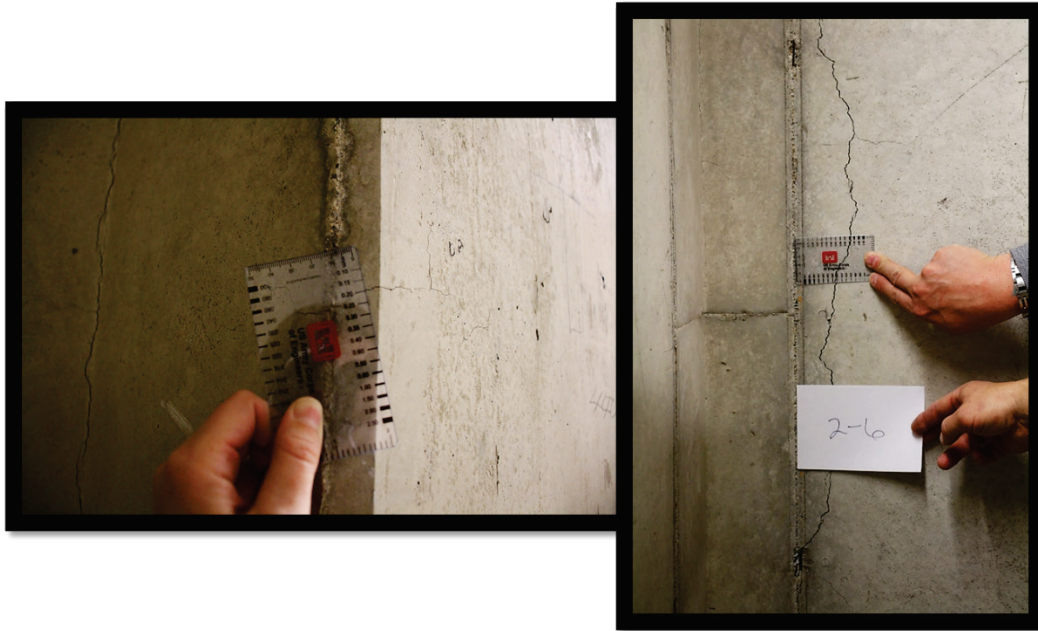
Cold joints in shafts behind elevators in Tower 2.
